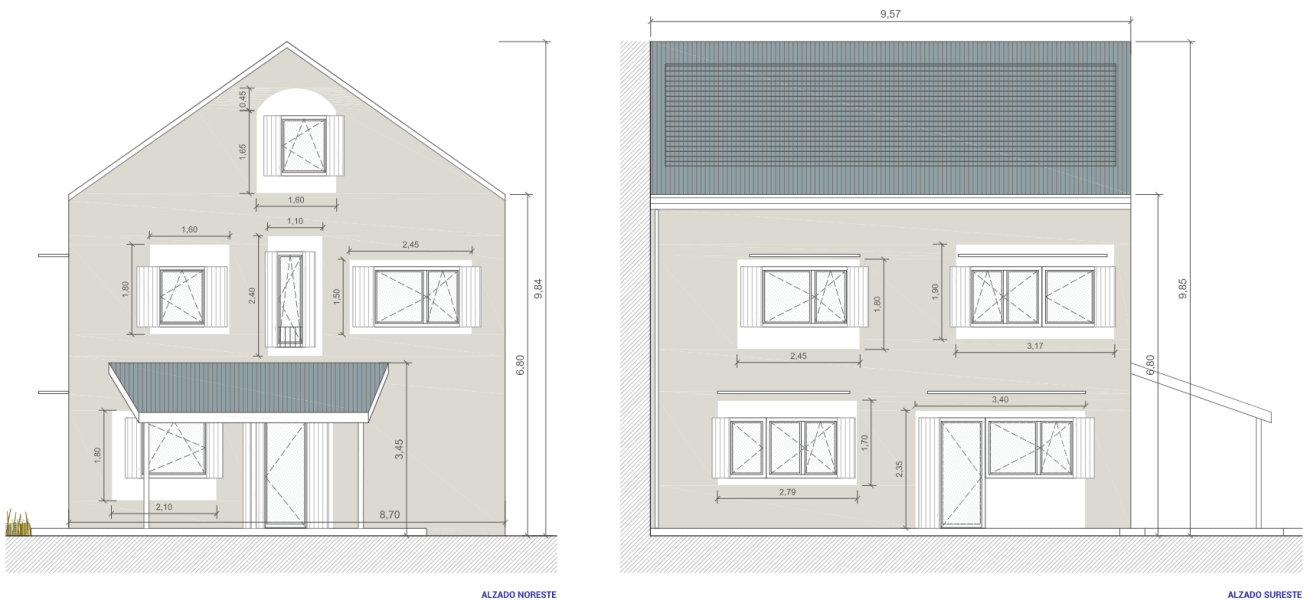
Lay-out of Scenario 2, Straw with renewables house in the north mountains of Madrid.
